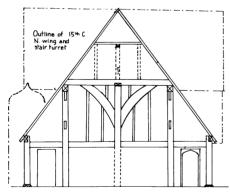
Section at D—D (upper end of hall, and originally an exterior wall), looking north.
